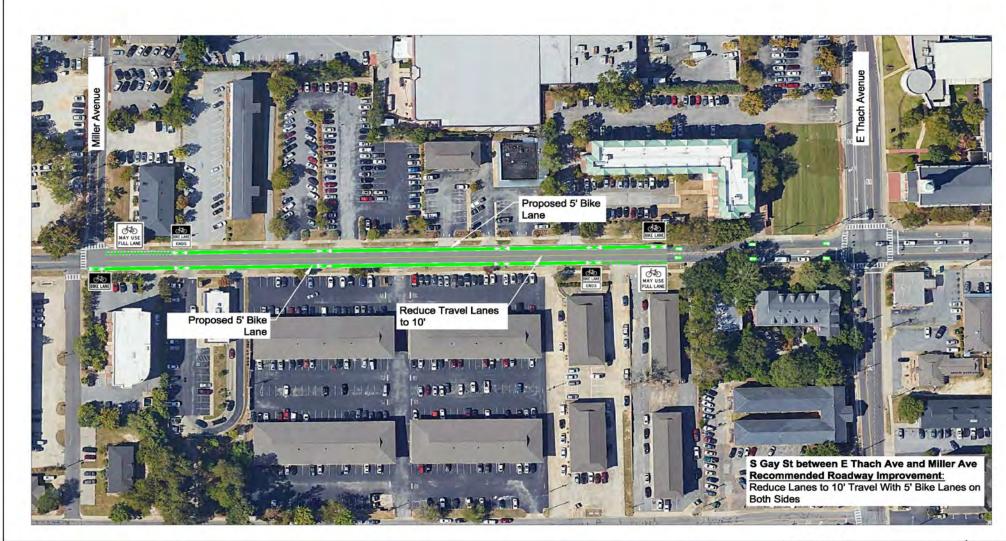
Recommended Roadway Improvements - Existing Conditions S Gay Street between E Thach Ave and Miller Ave Auburn, Alabama
